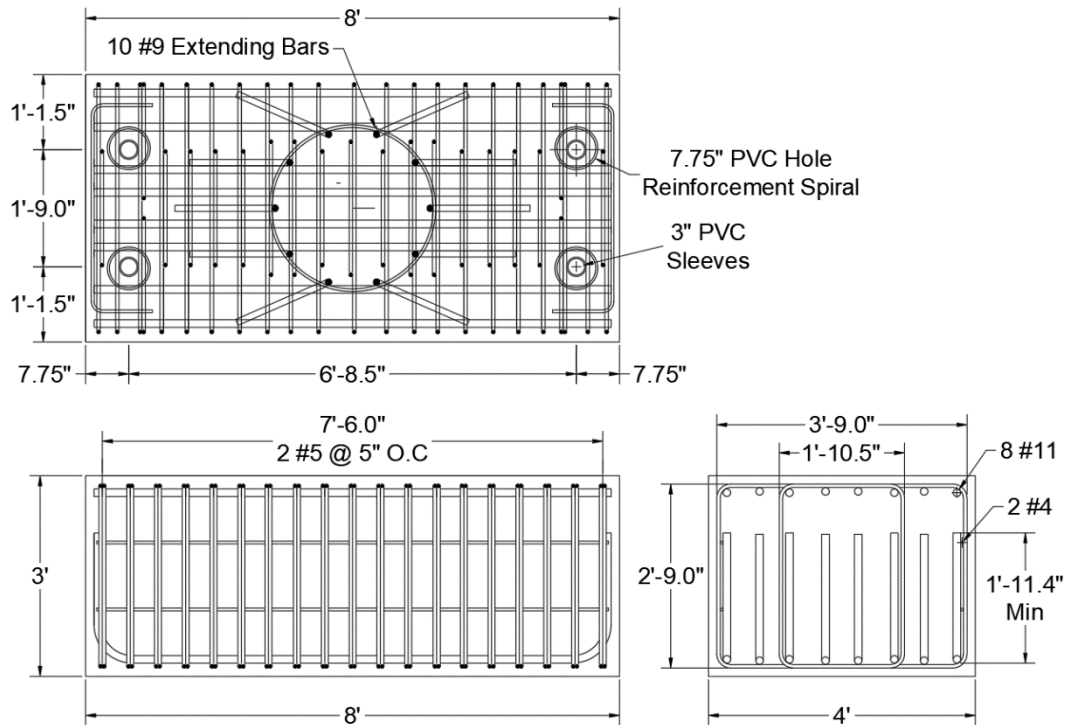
Final Rebar Layout for Specimen S1-CIP.
